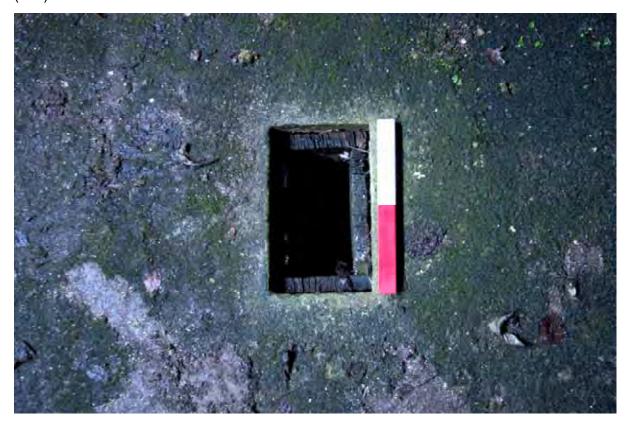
Store 4 – Detail of the floor sockets within each bay (eastern half), facing southwest (251)
